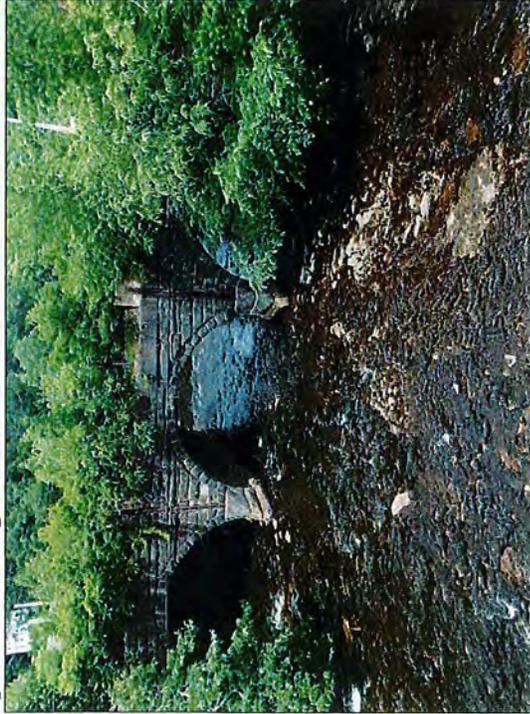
Kimball Street: Looking downstream to overgrown railroad bridge.
